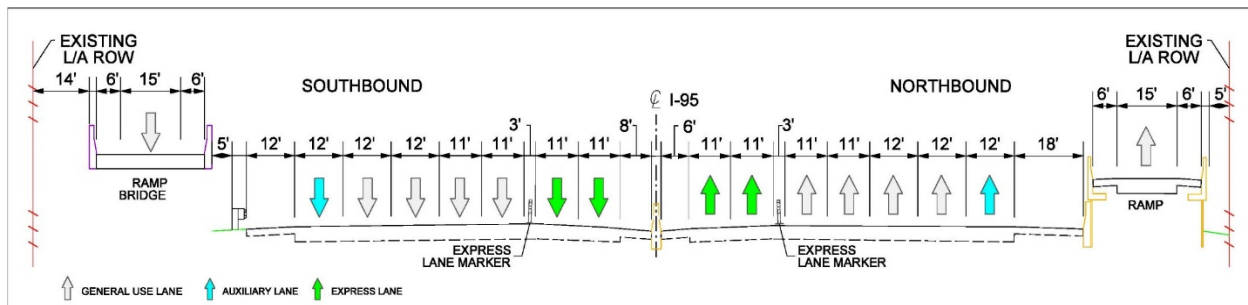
Alternative 1 Roadway Section North of Hallandale Beach Boulevard
